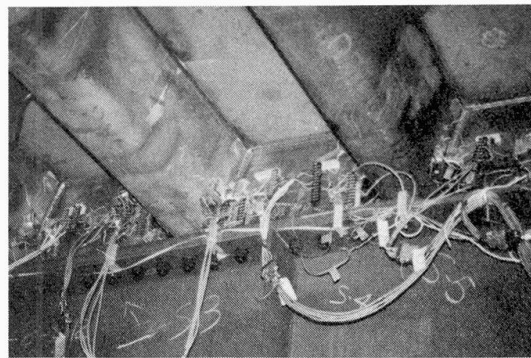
Typical diaphragm of the full-scale test showing strain gage locations near the rib connection.
